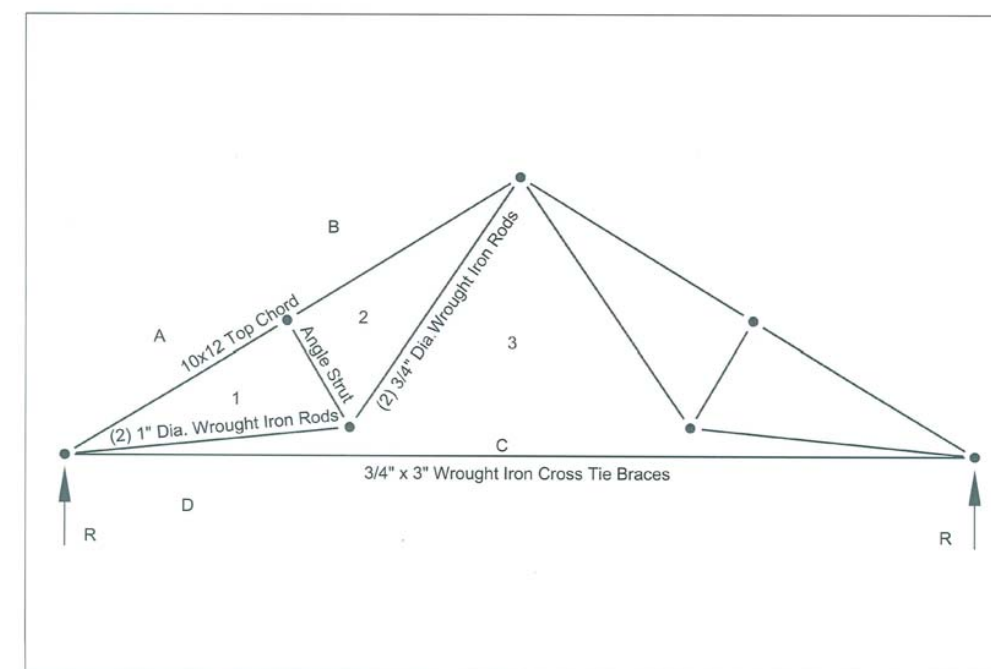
Testing and analysis indicates that the roof system acts as an A-frame with trussed rafters.
